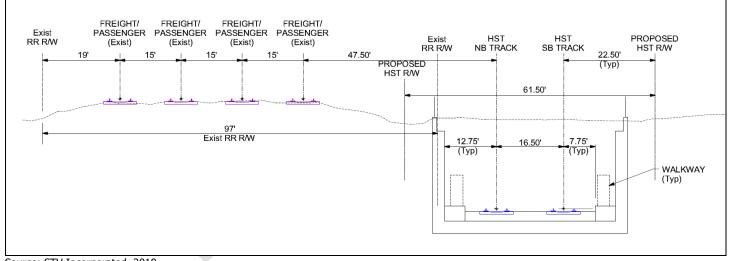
Typical Cross-Section – Fullerton Airport Trench
